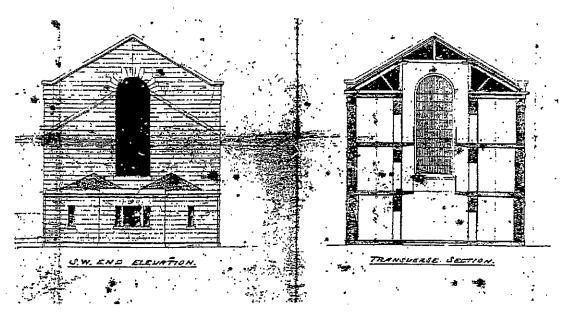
End Elevation and Cross Section of 'B' Wing, Signed Mortimer William Lewis, 23 August 1866 (Detail from DPW&S Plan Room PC 321/40)
